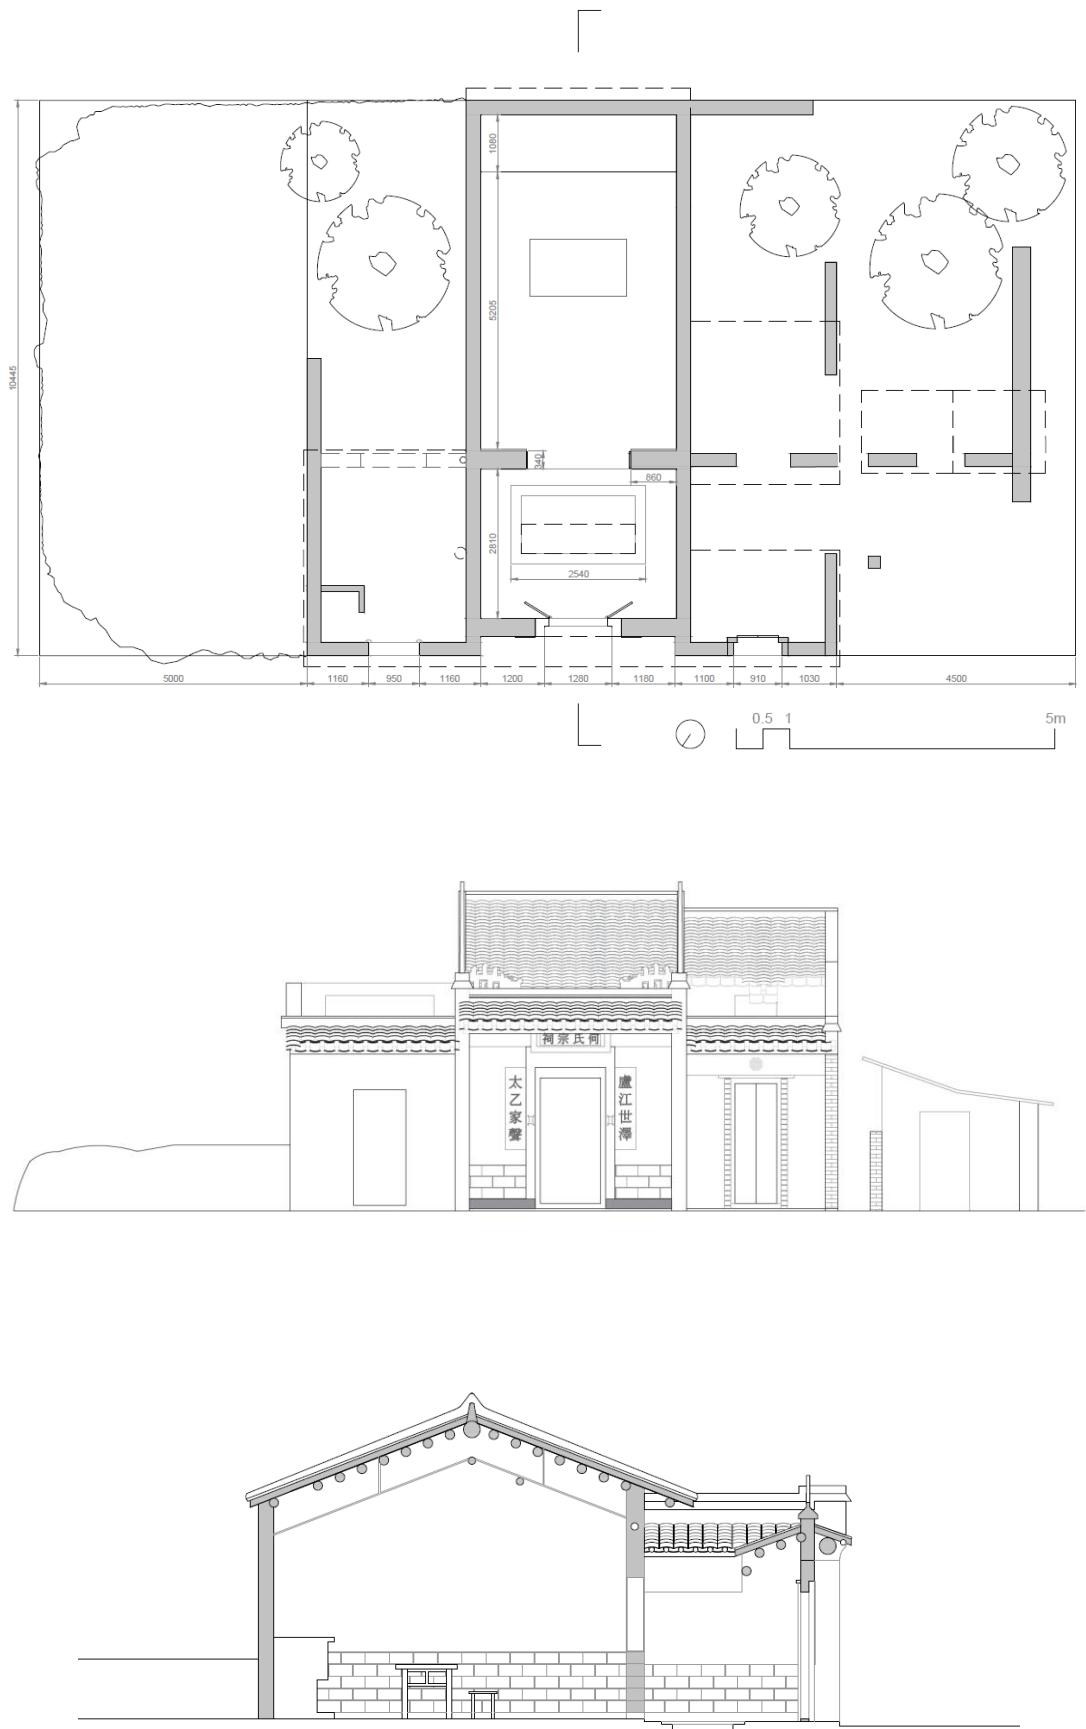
Elevation, plan and section of the ancestral hall of the Ho clan
